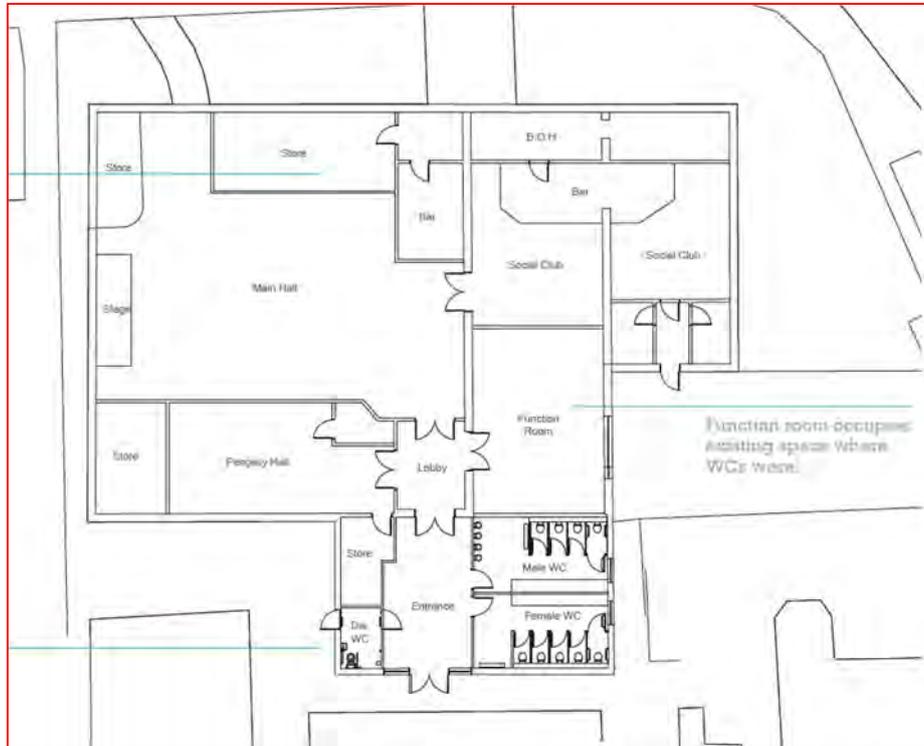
Option 2 Community Hall Proposed Ground Floor Plan
